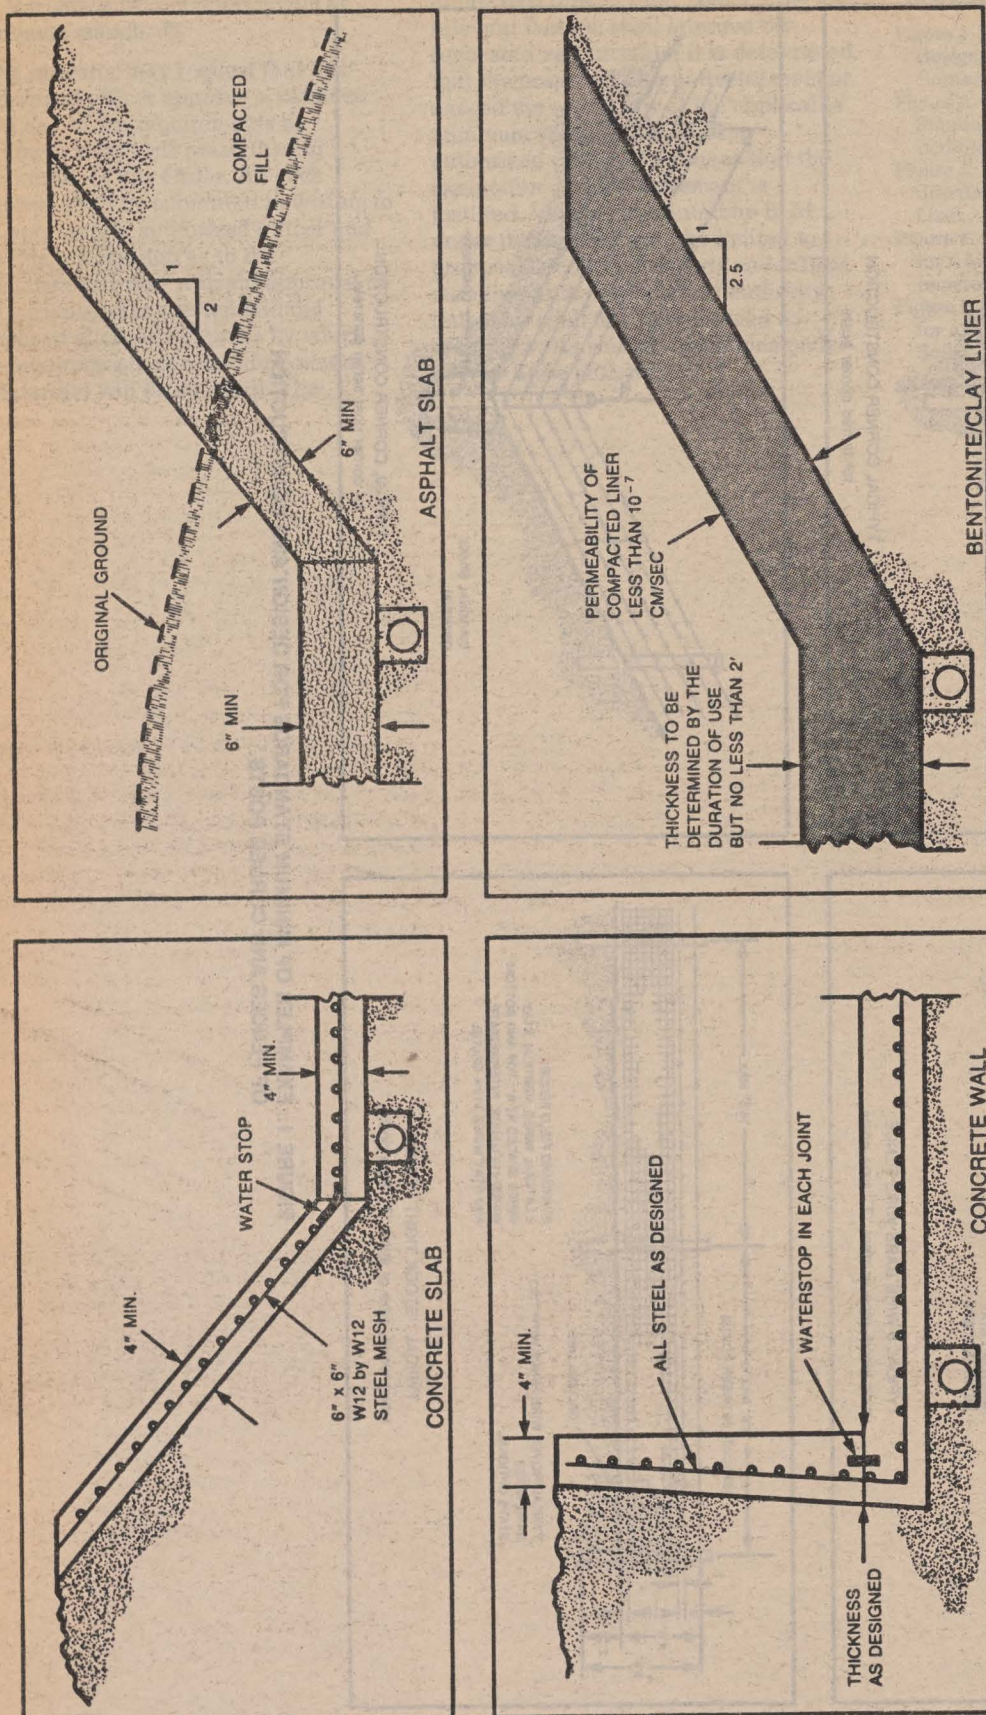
EXAMPLE OF MINIMUM ACCEPTABLE STANDARDS FOR CONCRETE, ASPHALT AND BENTONITE/CLAY LINERS.
